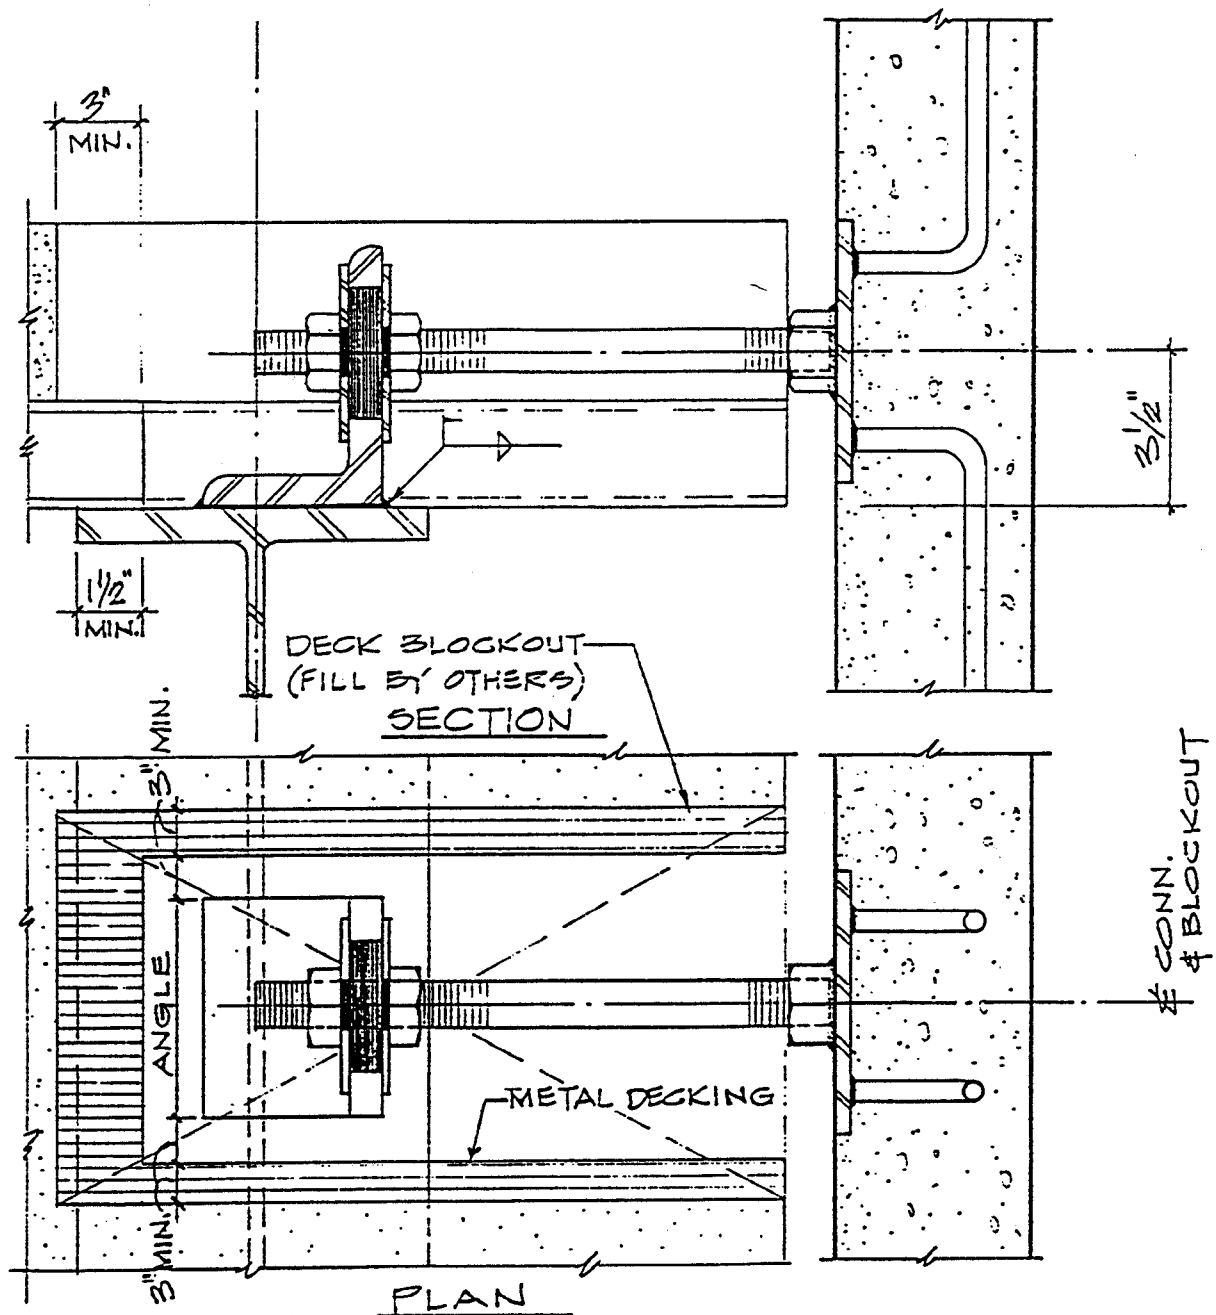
Lateral connection to floor (after Hegle [1989]).
